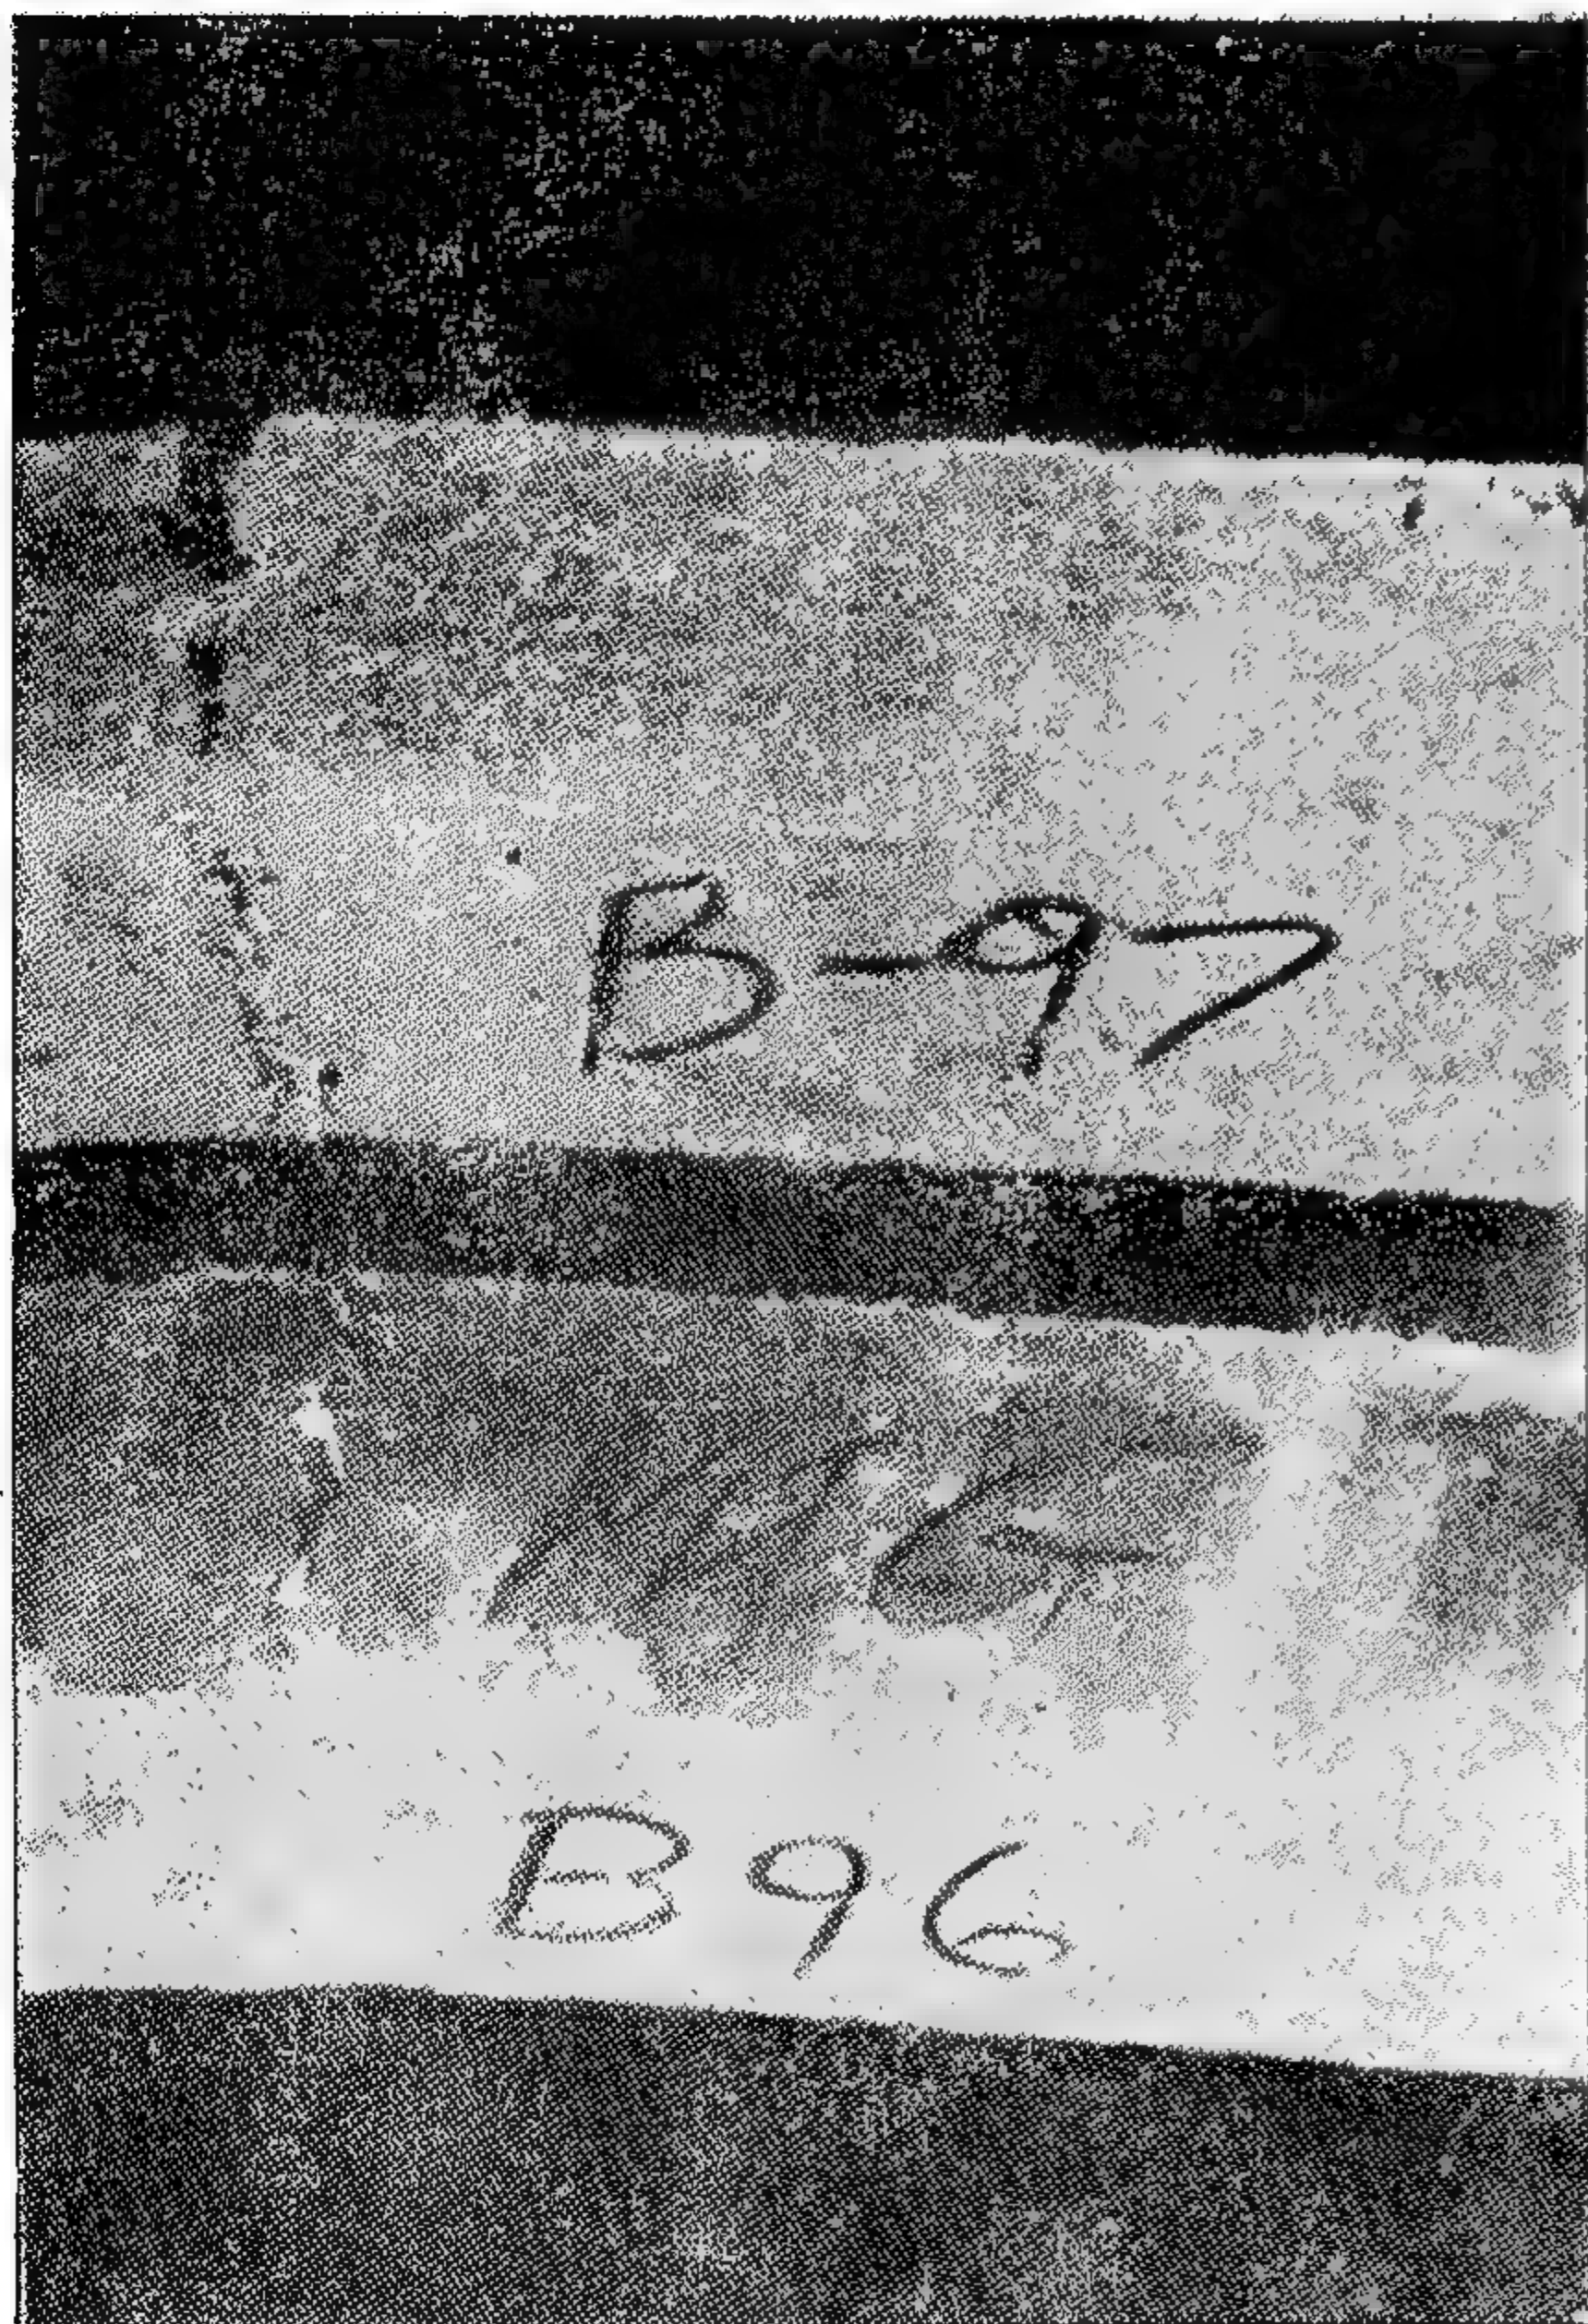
Impact (beam 97) and Flexure (beam 96) specimens failure cracks (loads were applied on side on which specimen number is written).
